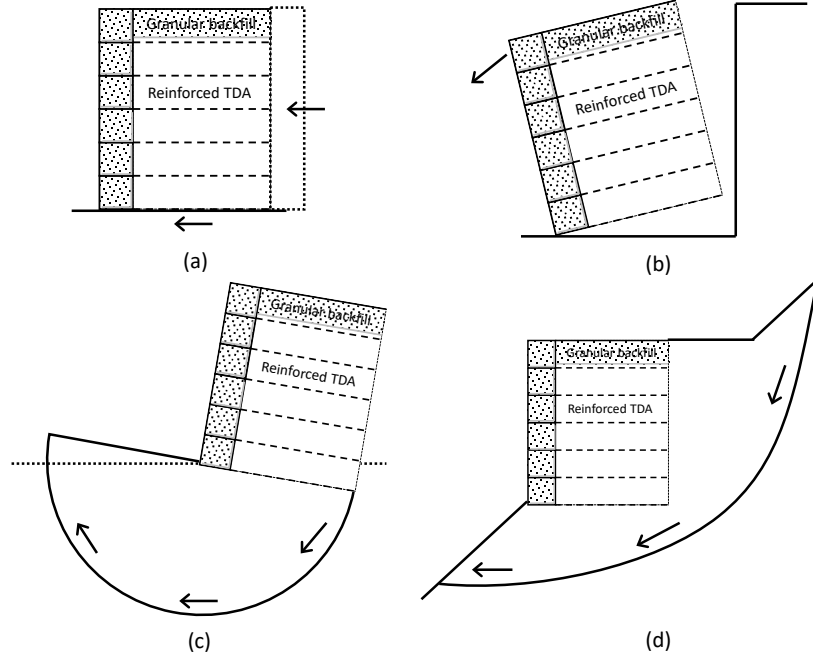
External Stability Modes for MSTDA walls: (a) Sliding; (b) Limiting Eccentricity; (c) Bearing Capacity; (d) Example of Global Stability (note that the critical failure surface for global stability may also go through the MSTDA wall)
